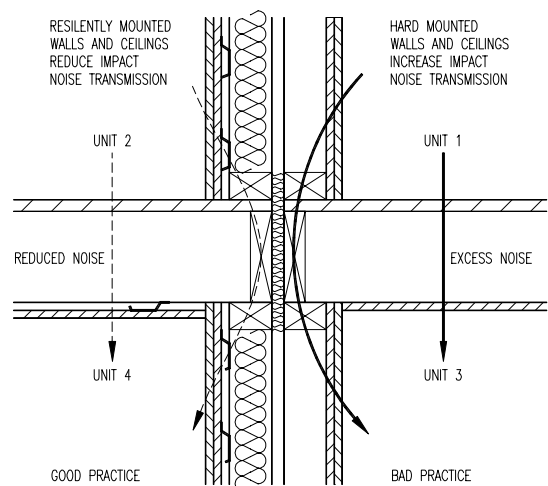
Wall and Ceiling Isolation in Timber constructions
